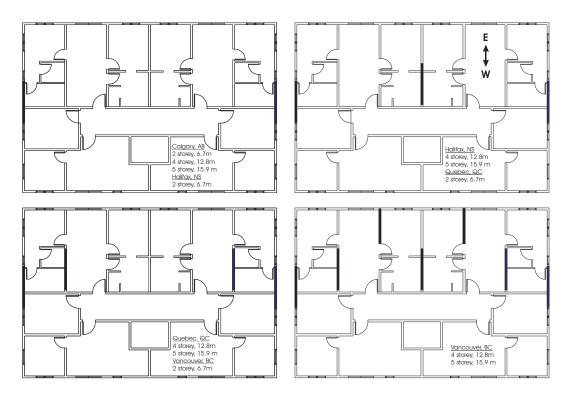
Plan view and location of braced bents (Cobeen et al., 2007)
